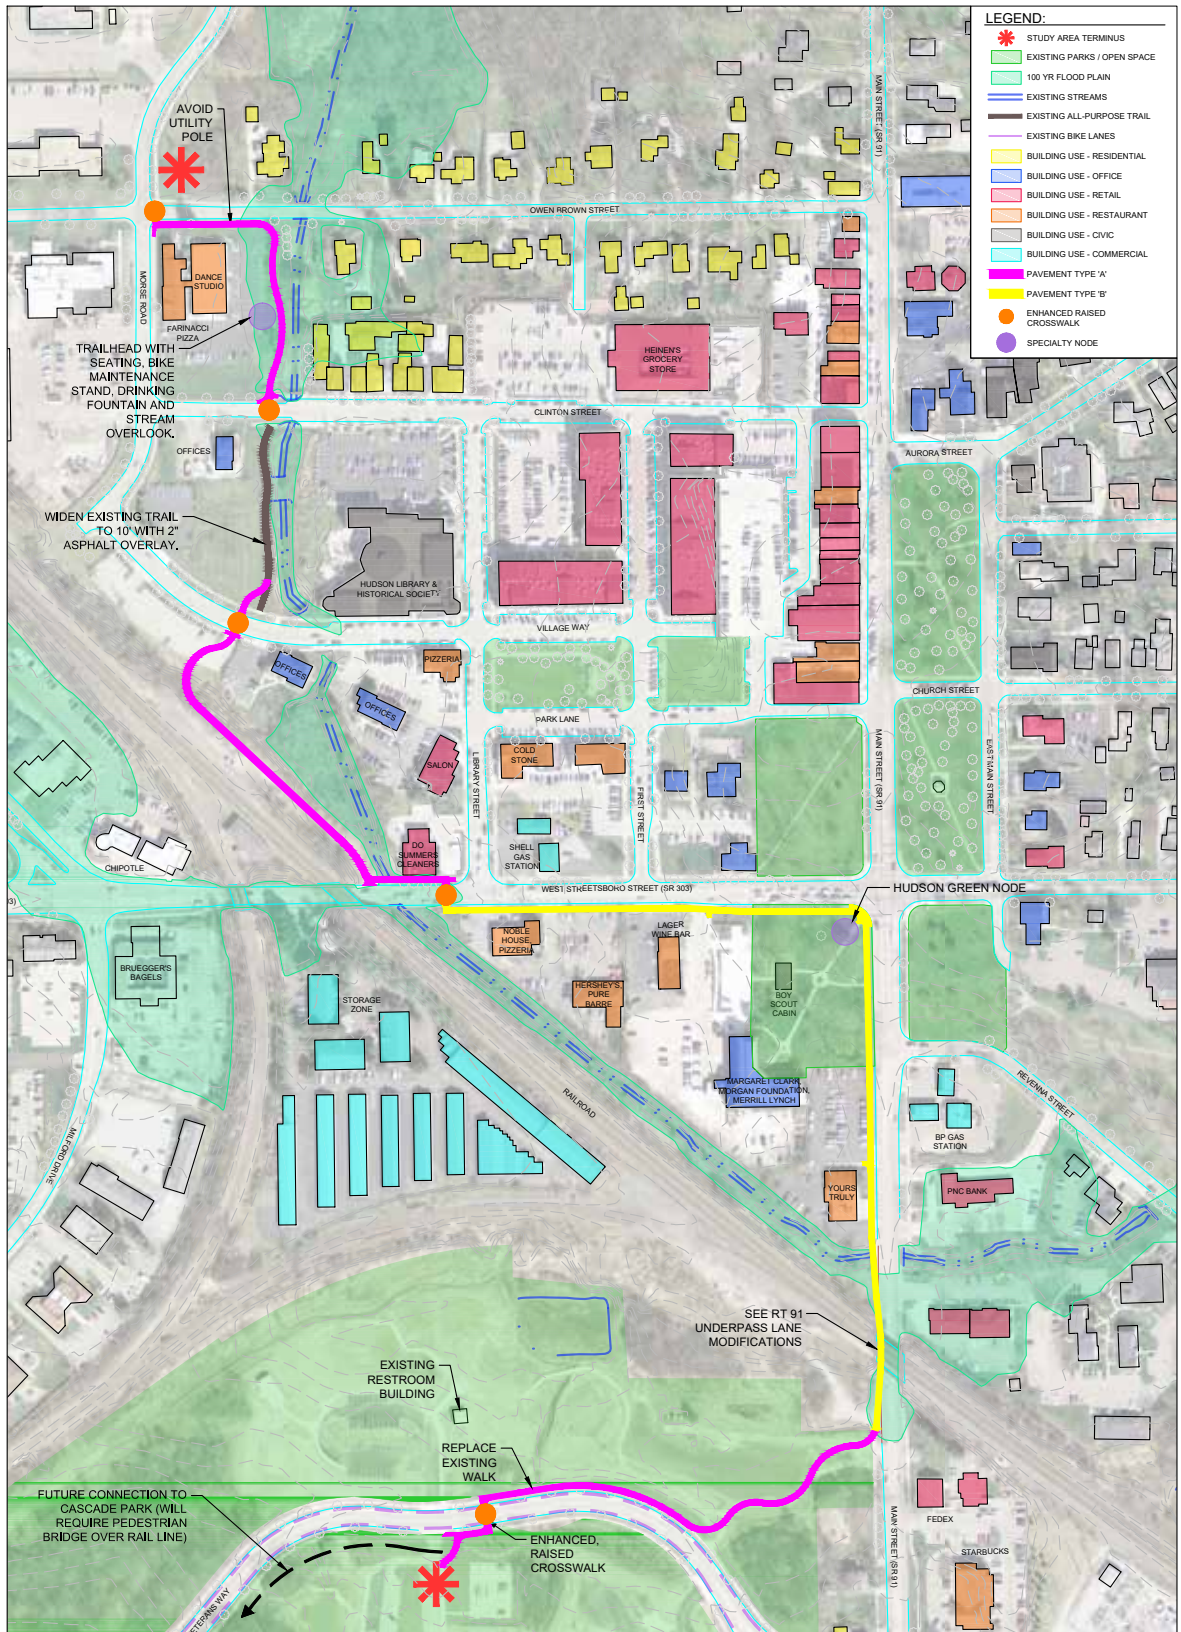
DOWNTOWN HUDSON TRAIL & GREENWAY PLAN
